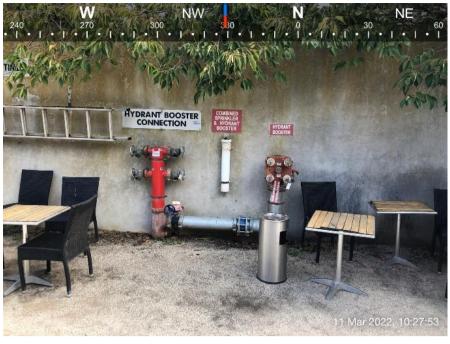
Location of new fire pump and water storage tanks, outlet adjacent to pool at northwestern extent of Mansion grounds
